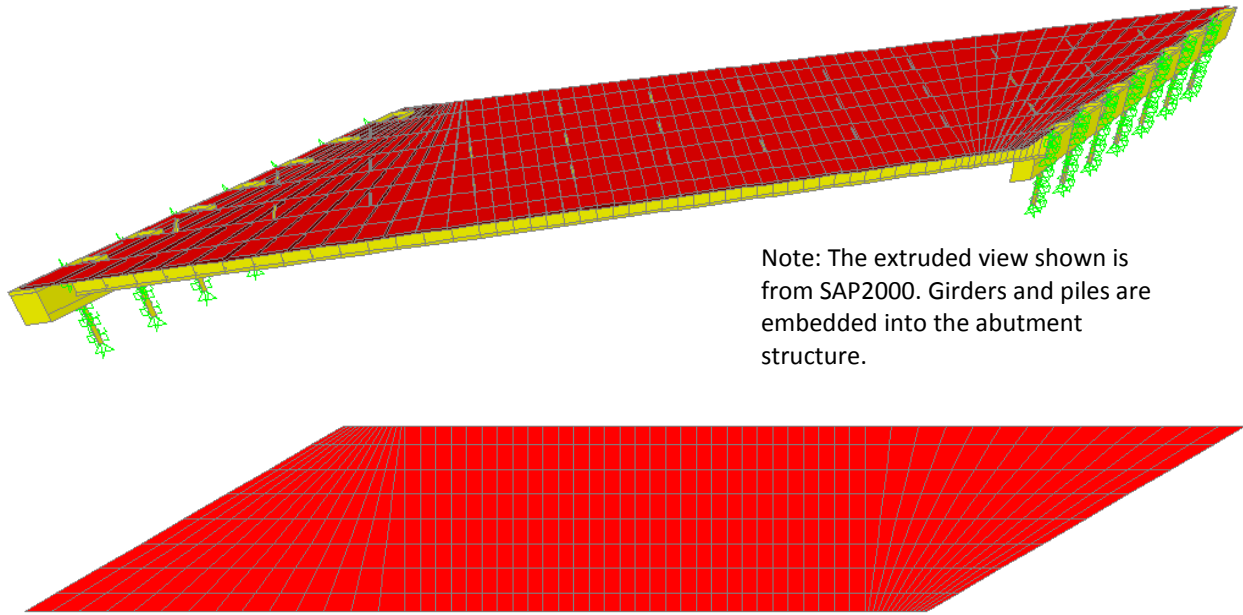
3D view and plan view of 60-degree Skew Bridge
